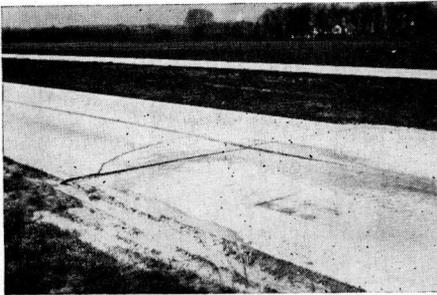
Pavement Pumping, U.S. Highway No. 30. Note mud stains and cracks.
